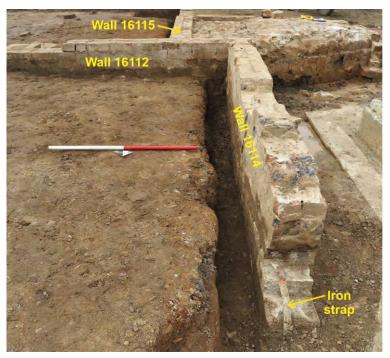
Typical sub-floor walls. The foundation trench cut (16142) has been partially excavated to the left of wall 16114 and an iron strap protrudes from where the wall has been cut by the Post Office footings. View to the south. Scale 1m. IMG_3124.
